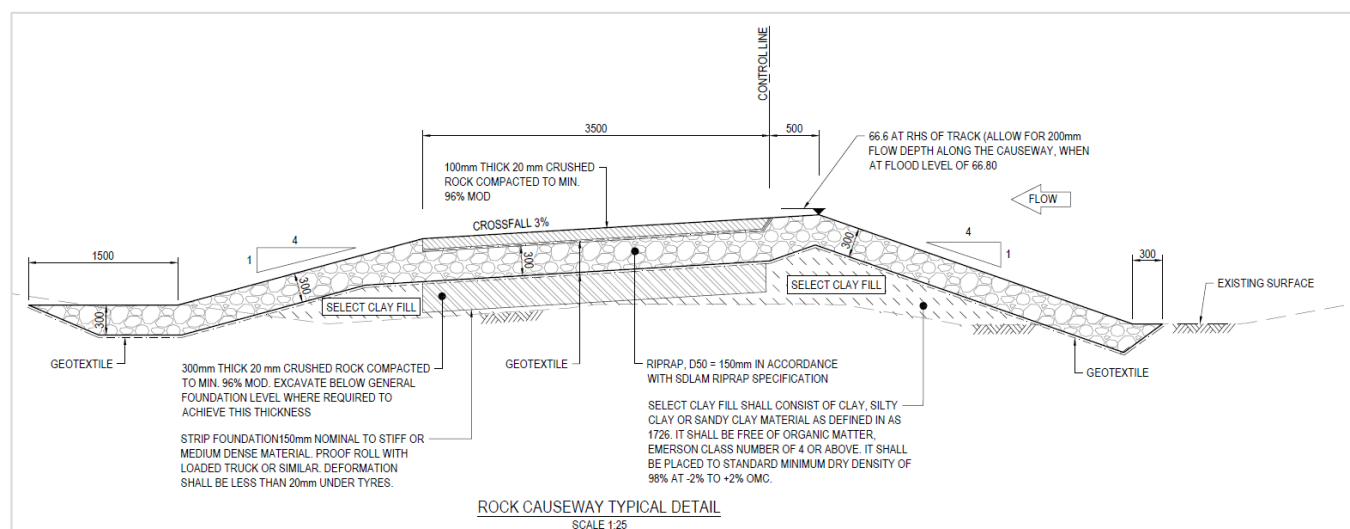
Indicative rock causeway cross section (refer Drawing DE19-823-YANC2-DE-CV-DRG-0360)
